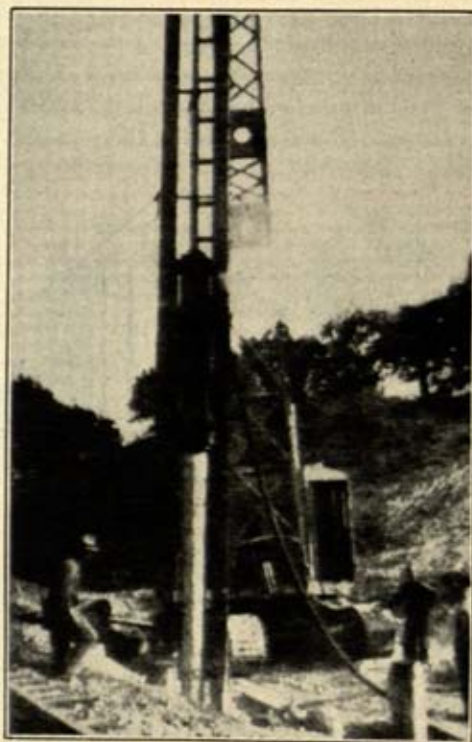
Open-type differential steam hammer driving wood pile. (*Vulcan Iron Works.*)
